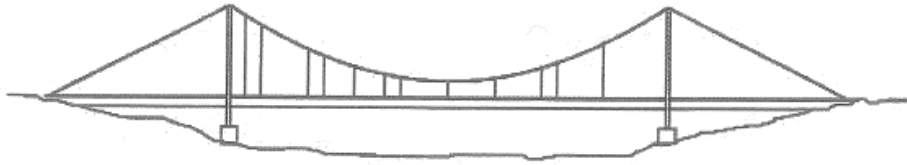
Suspension bridges scheme (Cesaro and Piva, 2003)
